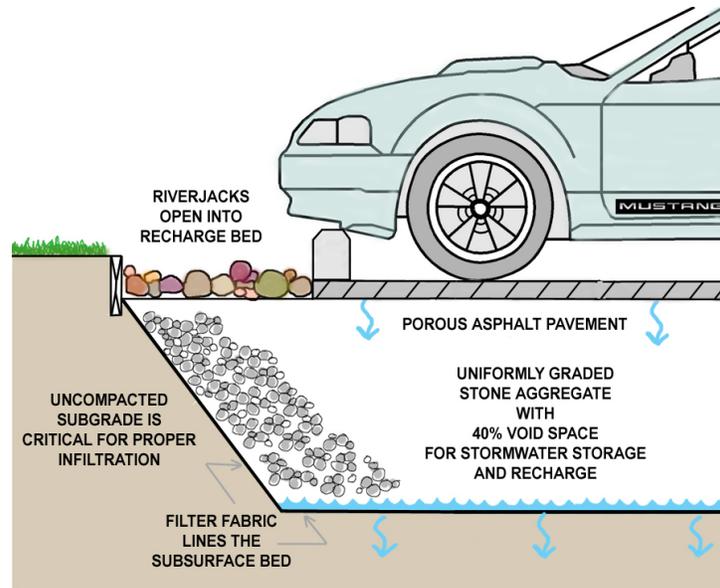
Conceptual design elements for porous pavement parking areas with subsurface infiltration
